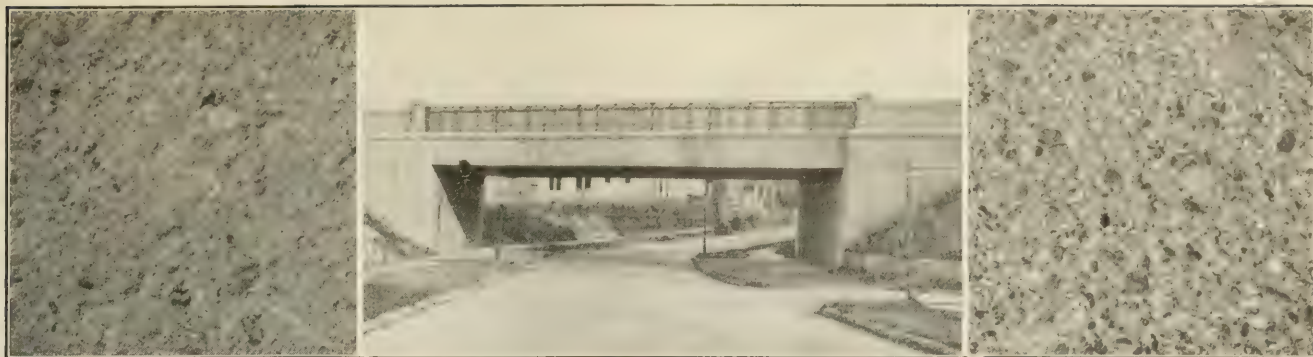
AND 4. CEDAR AVE. BRIDGE OVER DOAN BROOK
